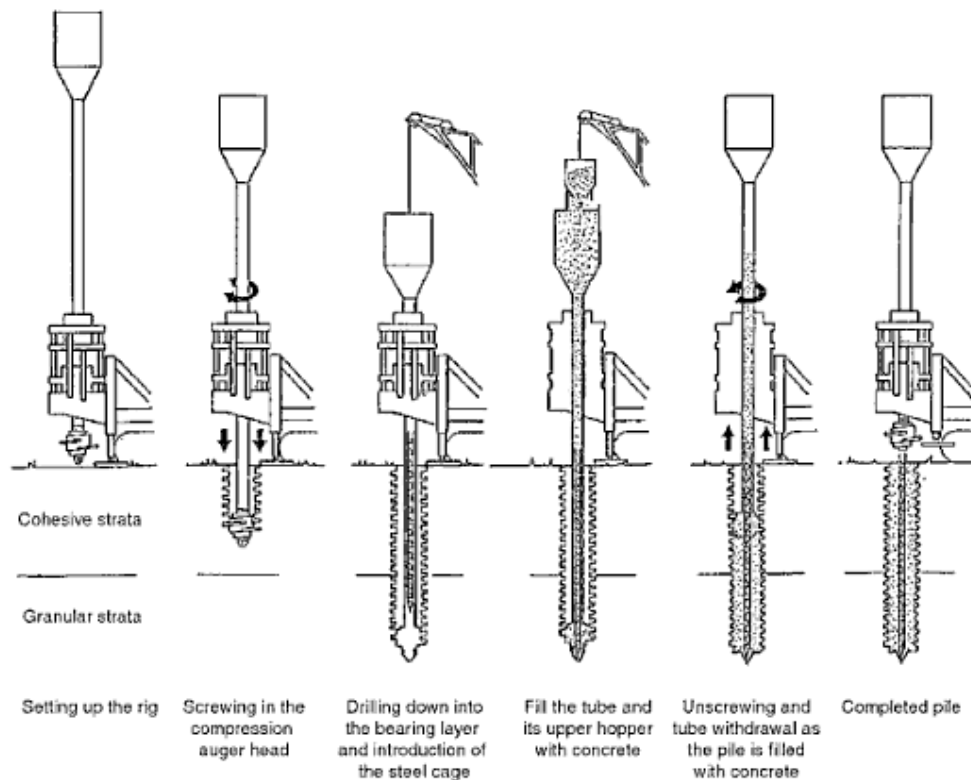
Schematic drawing of the installation process of the Atlas piling system (Flemming, K. et. al. 2009)
